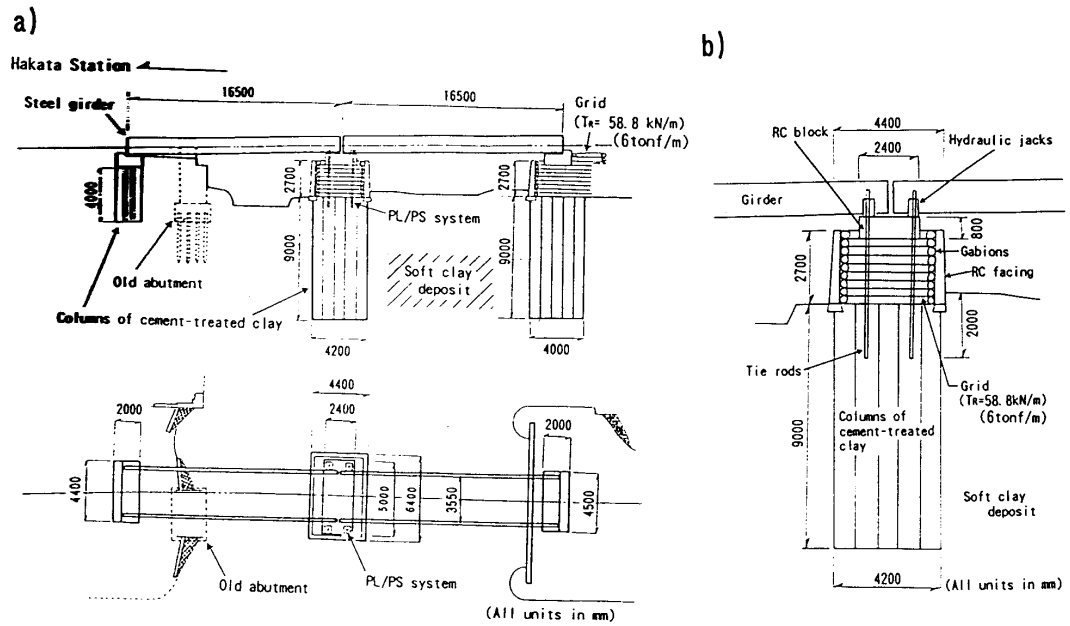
Prototype Preloaded/Prestressed GRS Bridge Pier (After Uchimura *et al.*, 1998)
